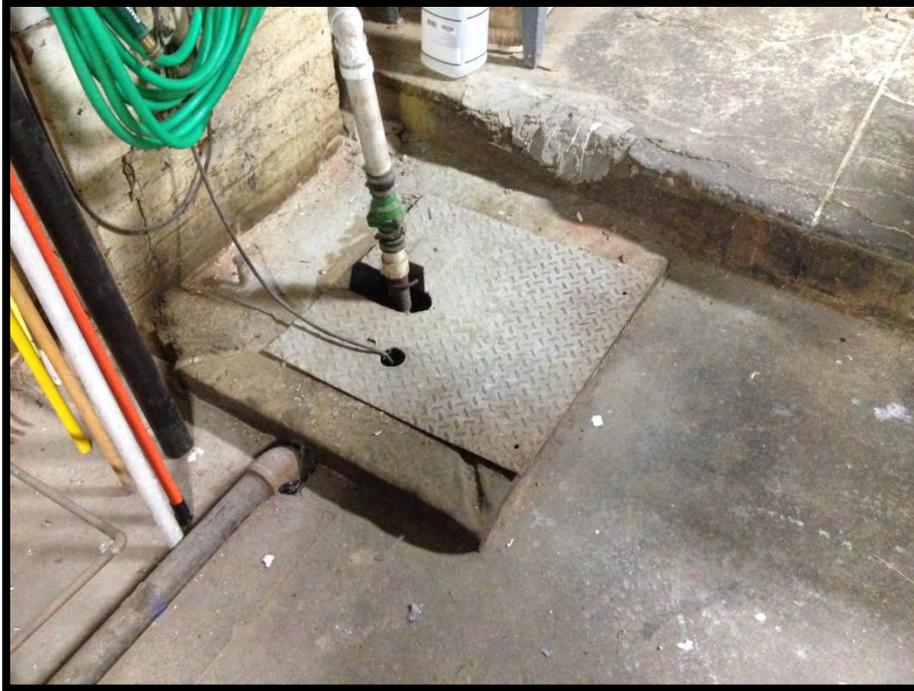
View of sump in sub-basement in 2201 Spring Grove Avenue.
